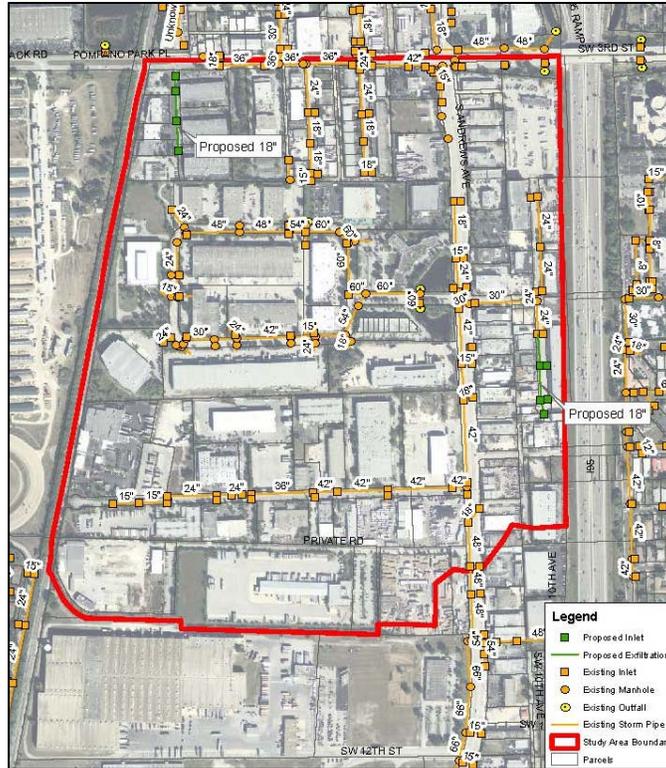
Pompano Park Place & Andrews Avenue Recommended Alternative
